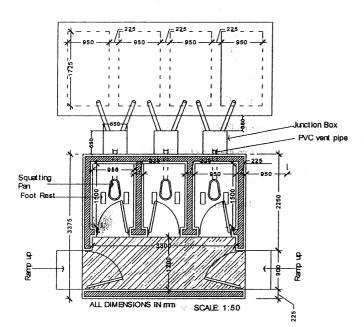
Floor Plan of the 3-compartment Pour Flush Toilet
